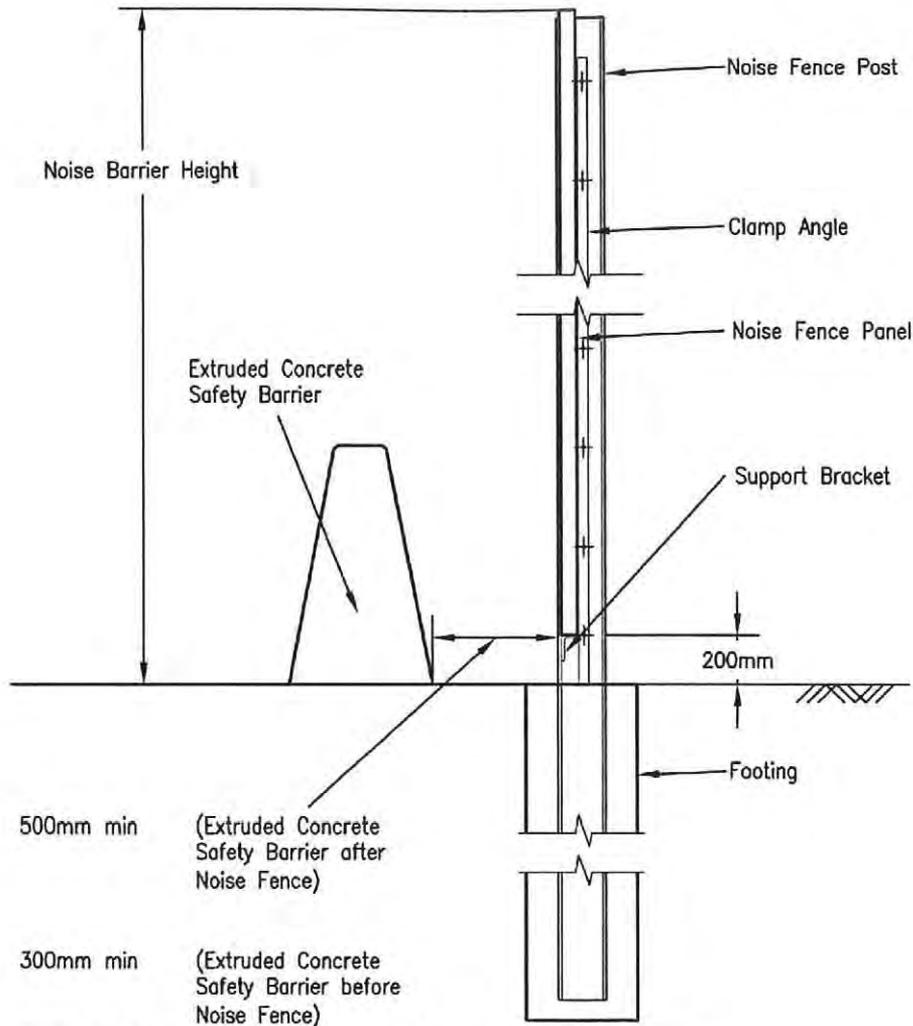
(c) Option C – Extruded Concrete Safety Barrier
